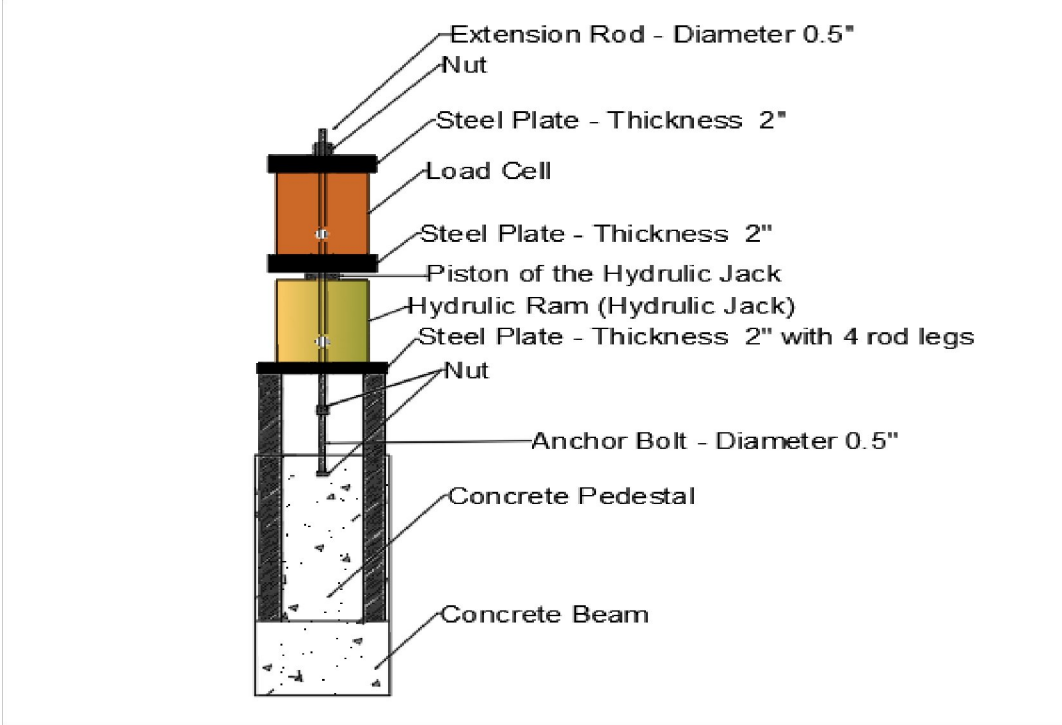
Single Anchor Pullout Test Set-Up (Schematic)
